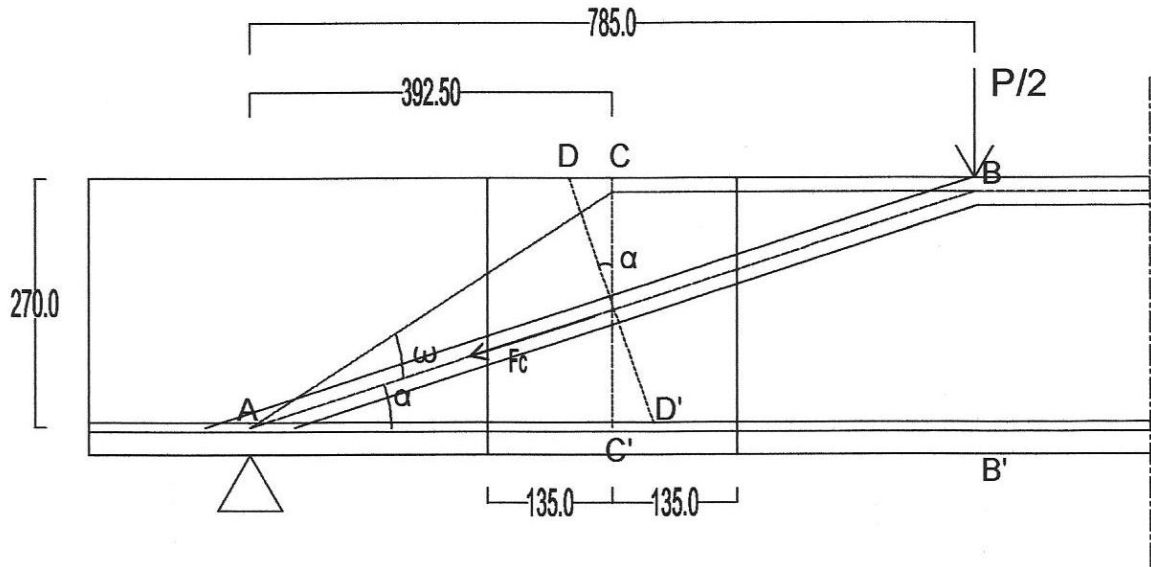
Transverse Reinforcement design for beam without axial load.
